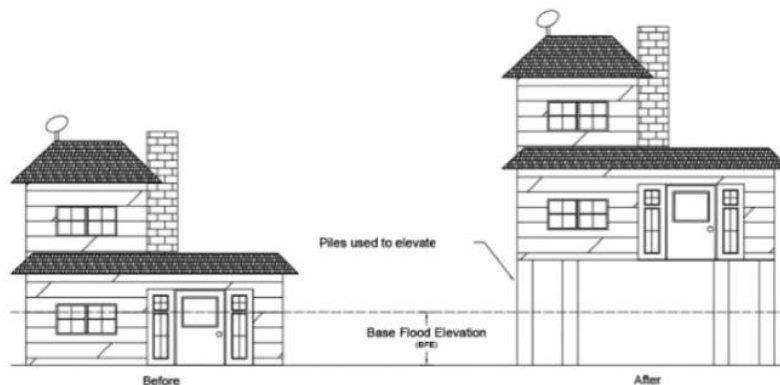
Before and after structure elevation depiction (njfloodalert.com).
